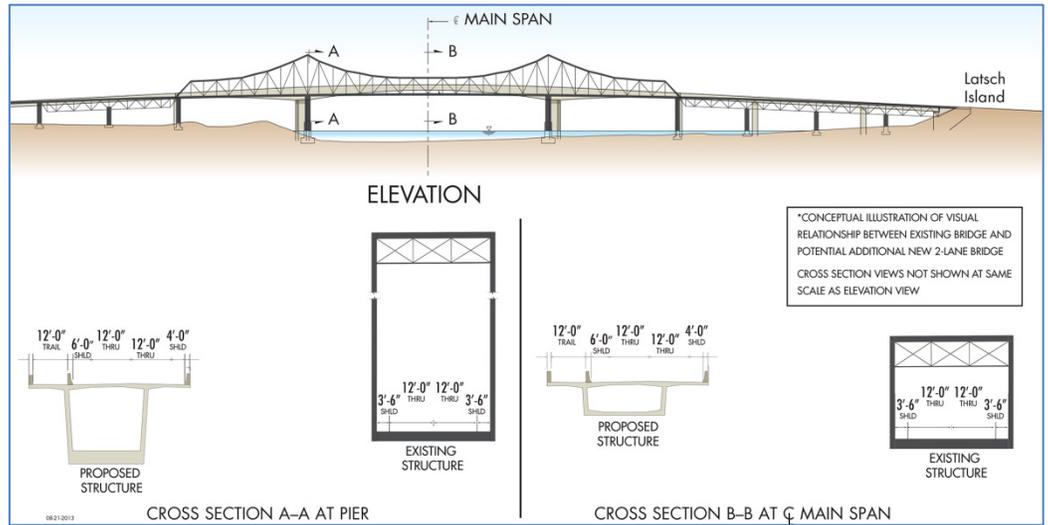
Arch Bridge Type. Concept Elevations and Cross Sections in Relation to Existing Bridge.
